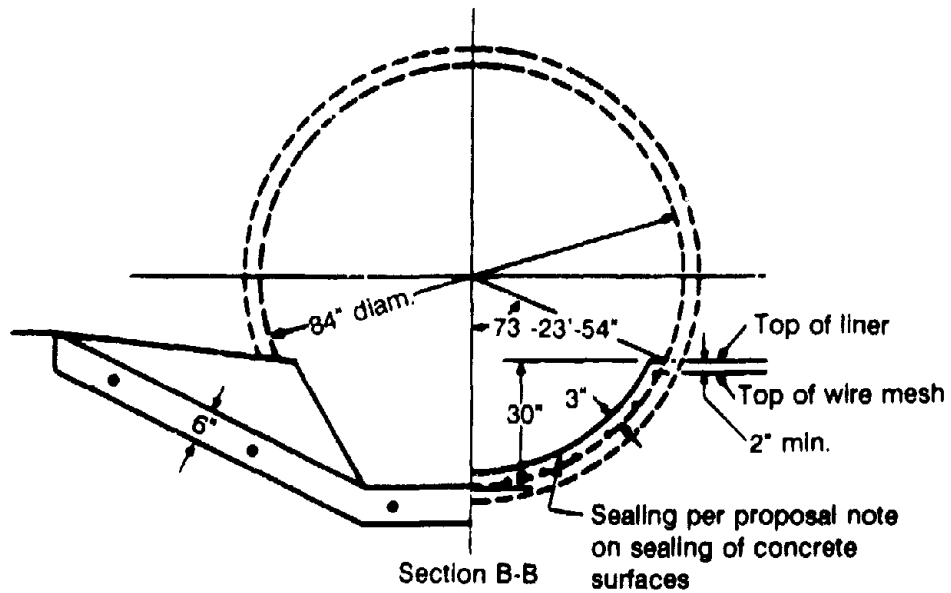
Cross section for Ohio invert paving.⁽³⁾
